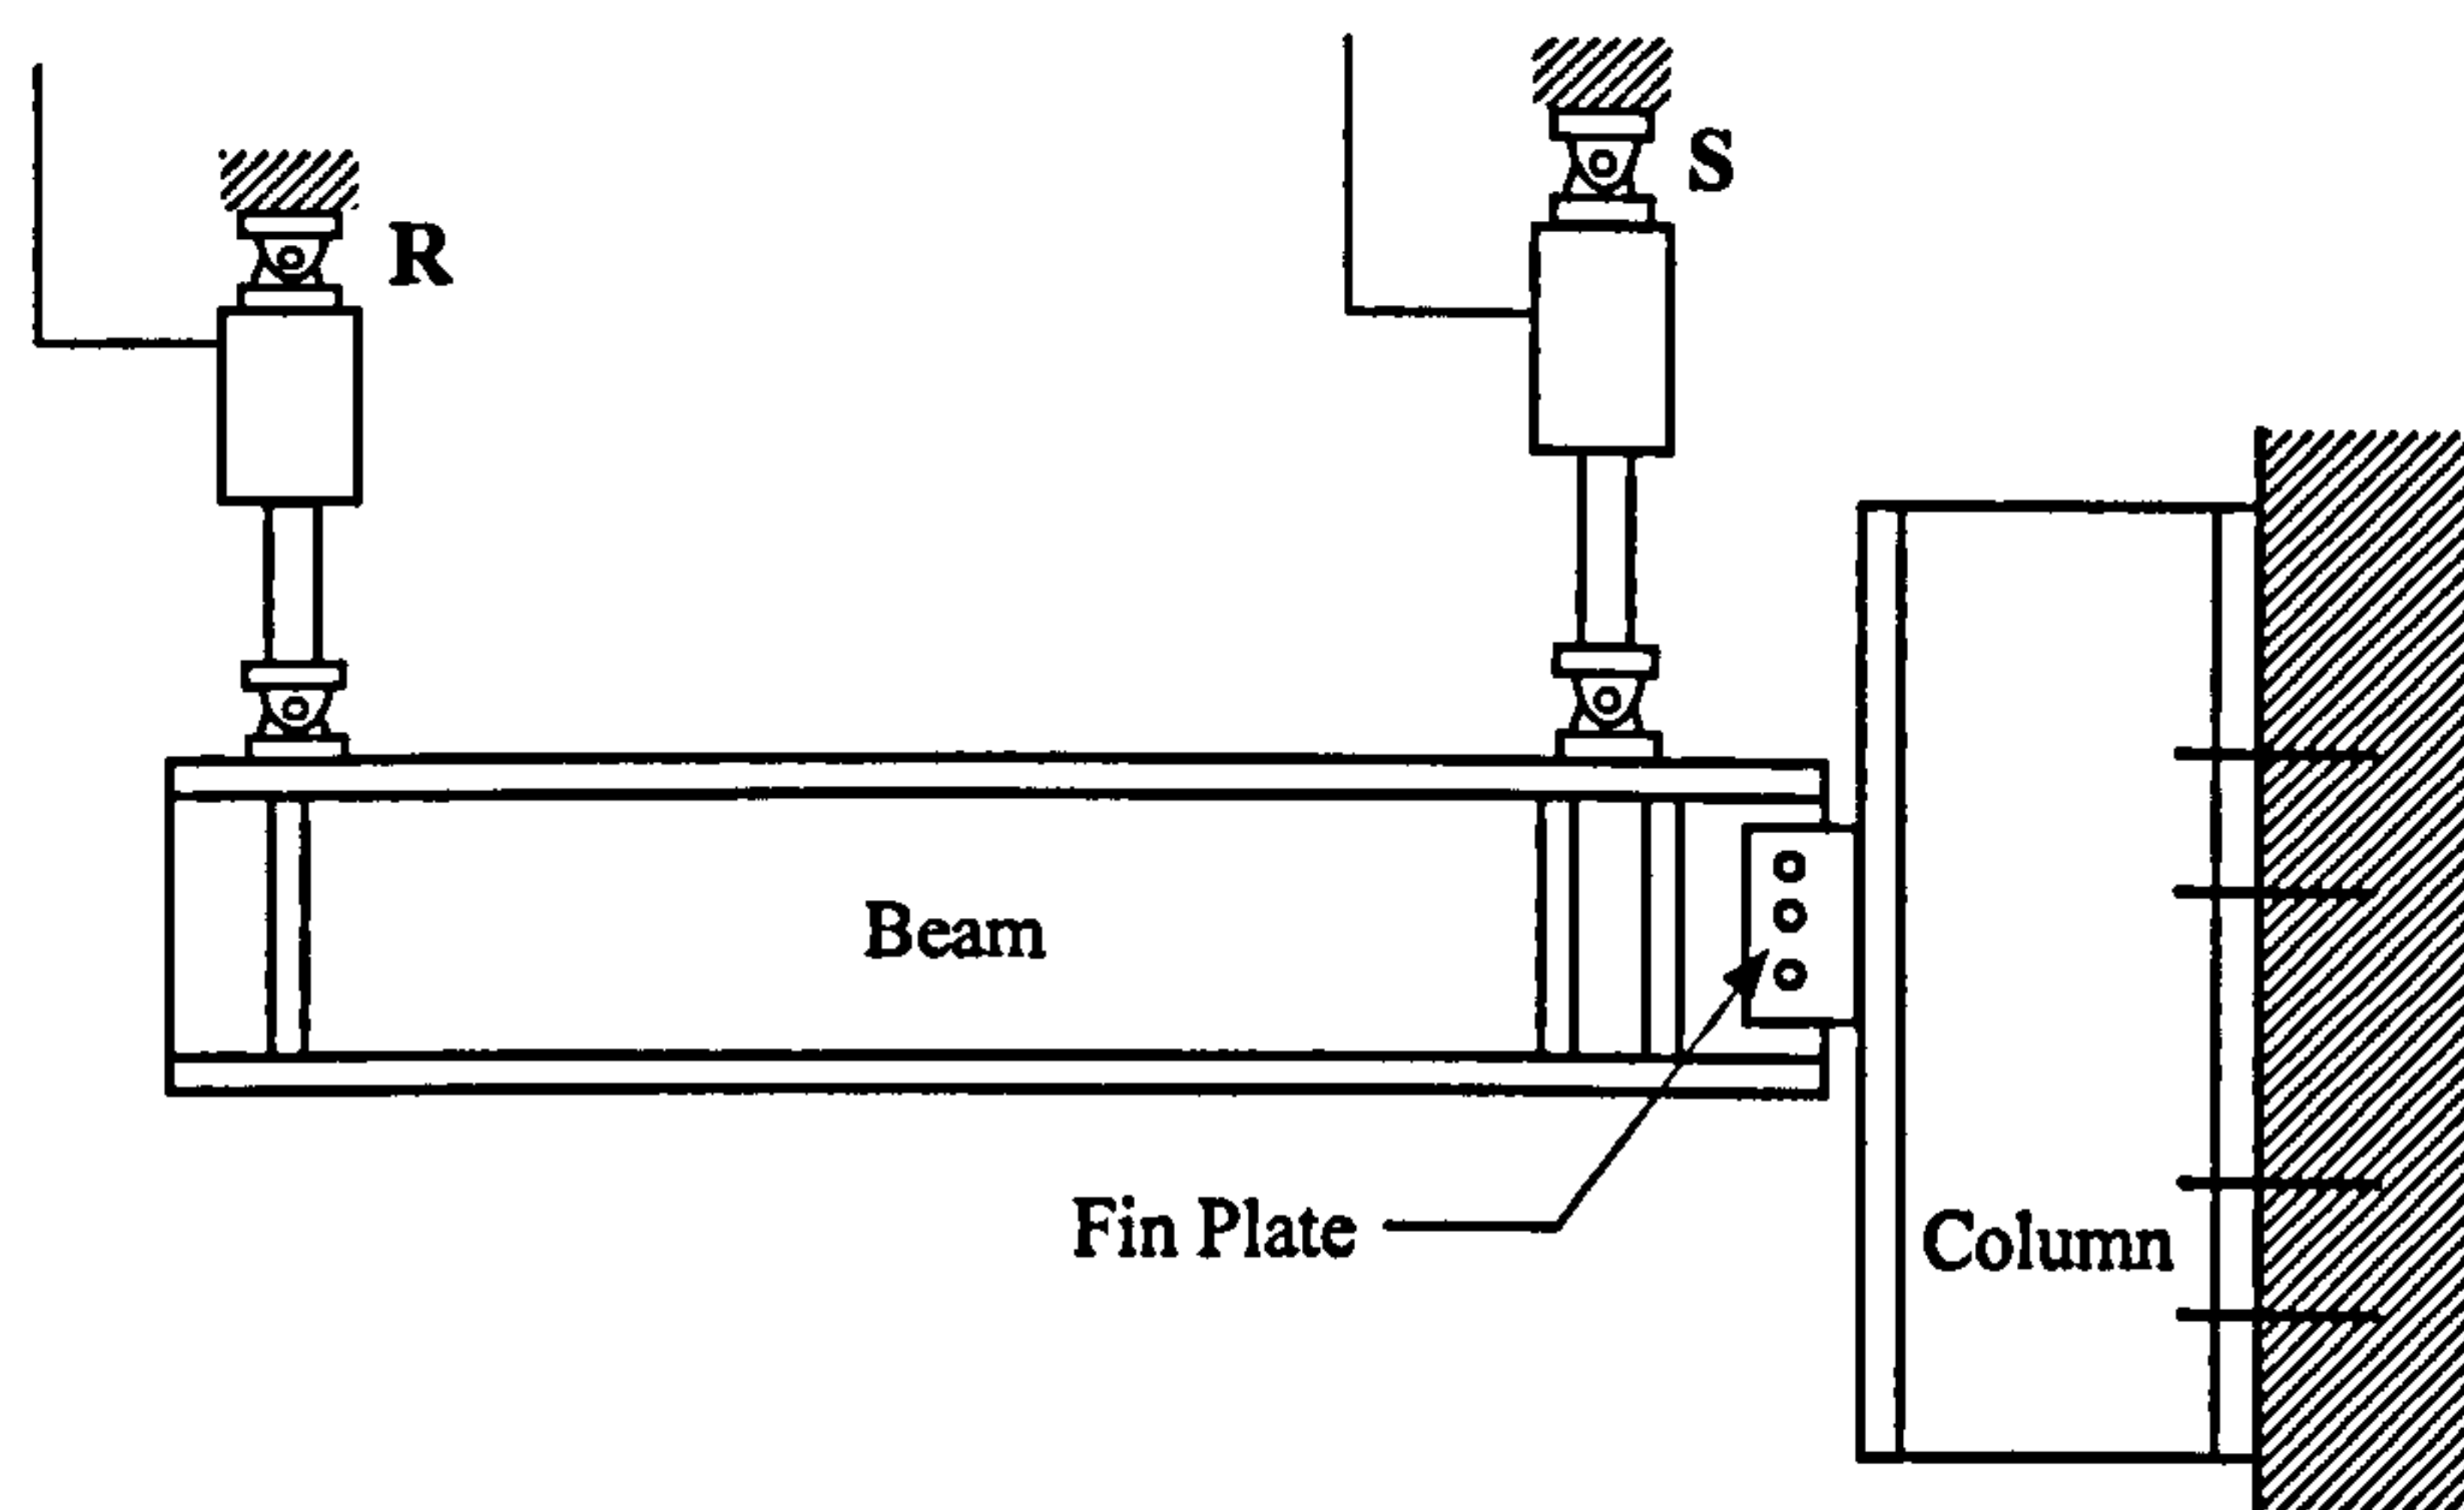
Astaneh *et al.* fin plate shear connection test setup
